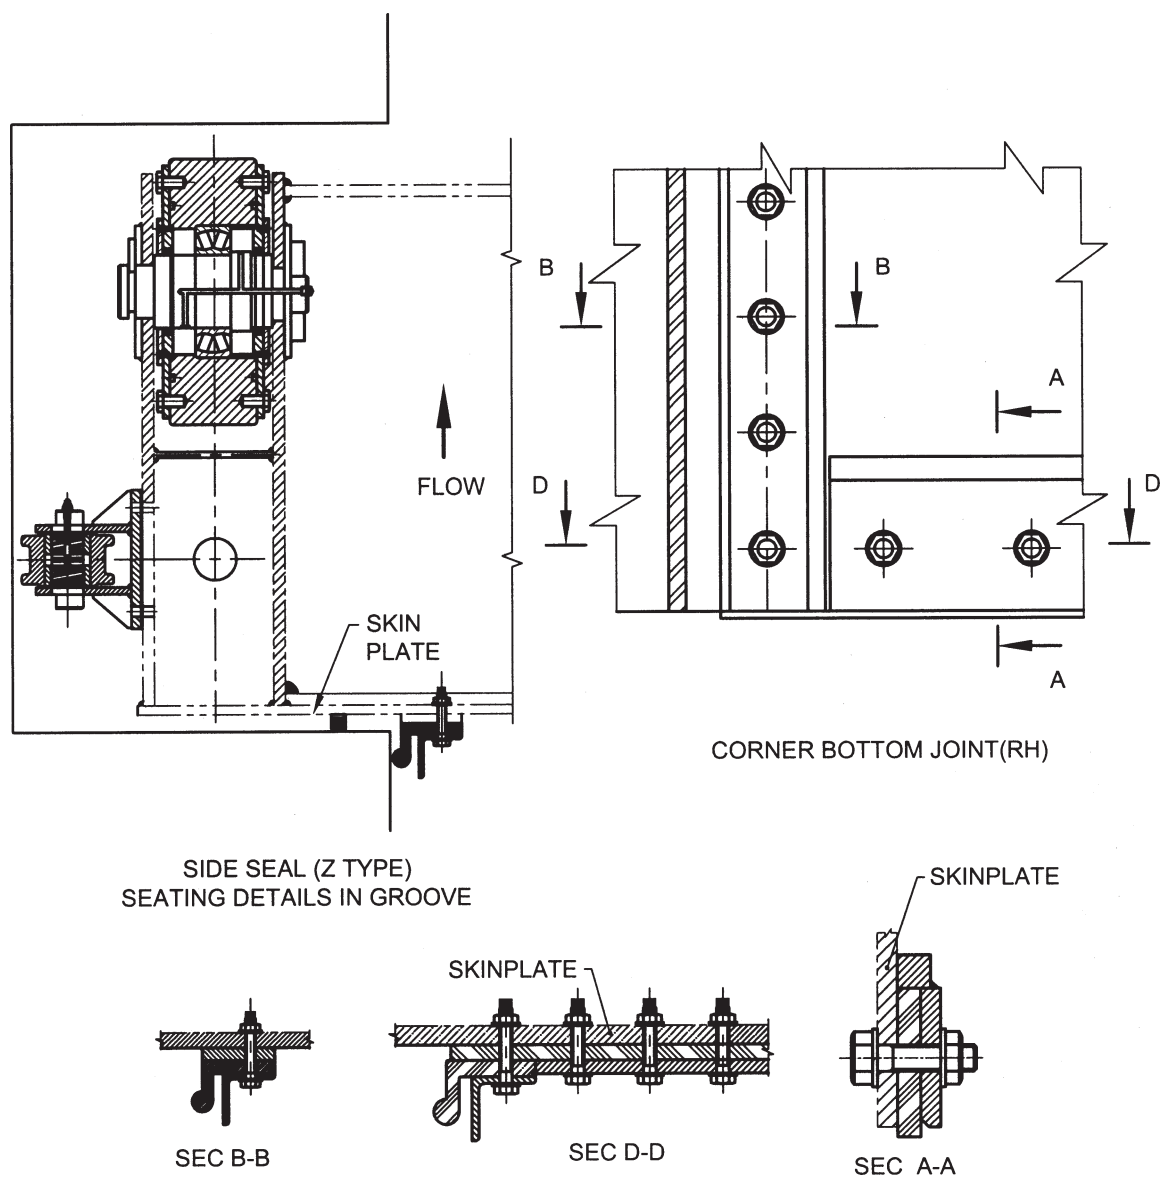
SIDE AND BOTTOM SEAL JOINTS (UP STREAM) FOR GATES NOT HAVING TOP SEAL
